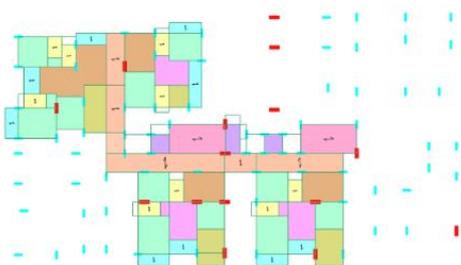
Building Plan.3: 3<sup>rd</sup>,6<sup>th</sup>,9<sup>th</sup> and 12<sup>th</sup> Floor
